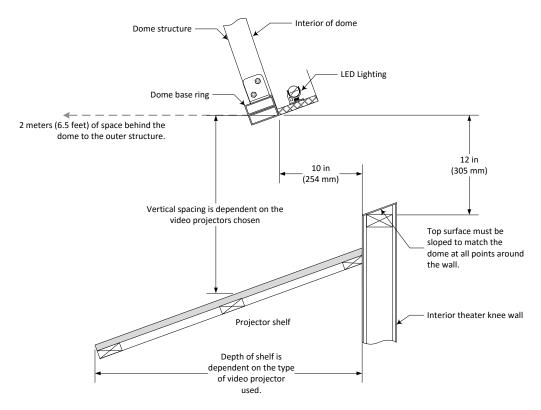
Cove: Dome and Knee Wall Spacing (Tilted Dome, Front Center)
